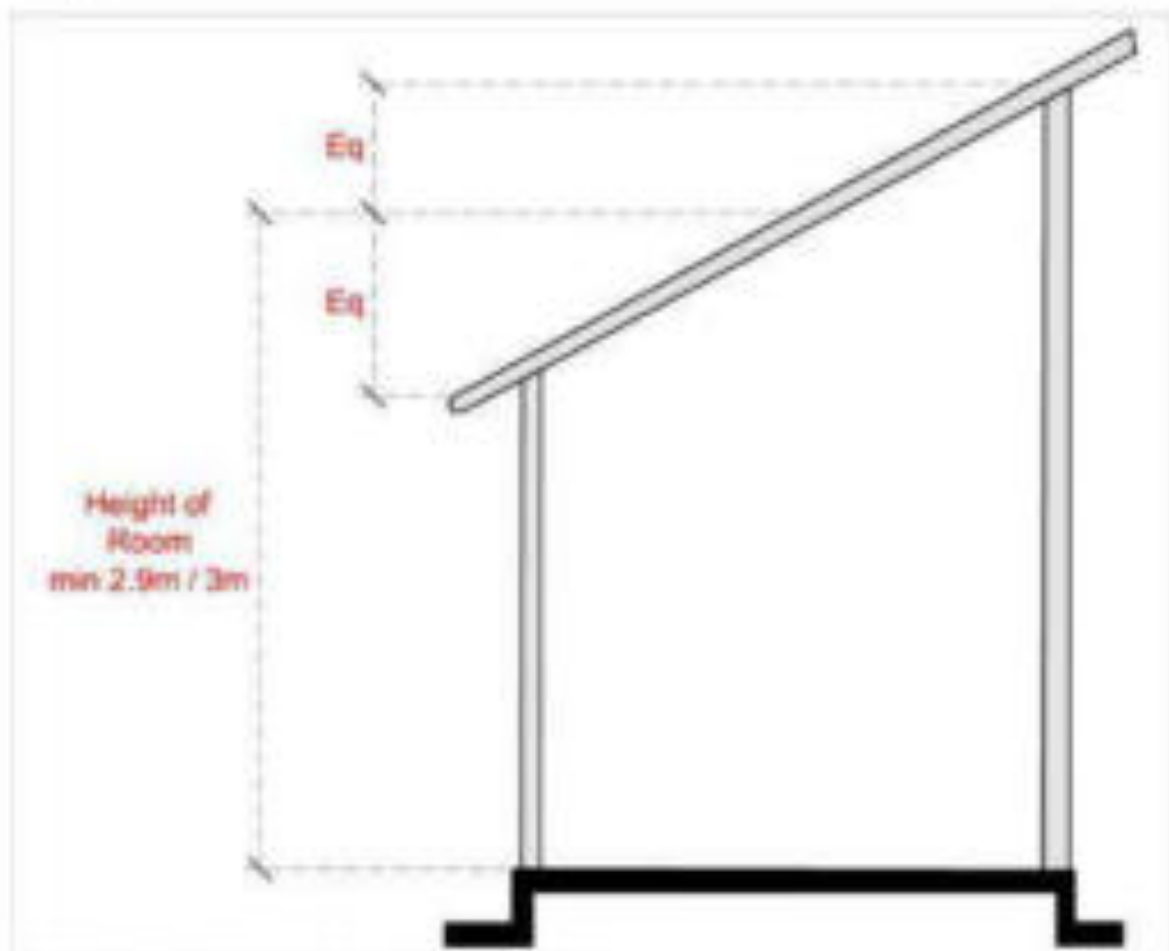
Minimum Clear Height for Sloping Roof
